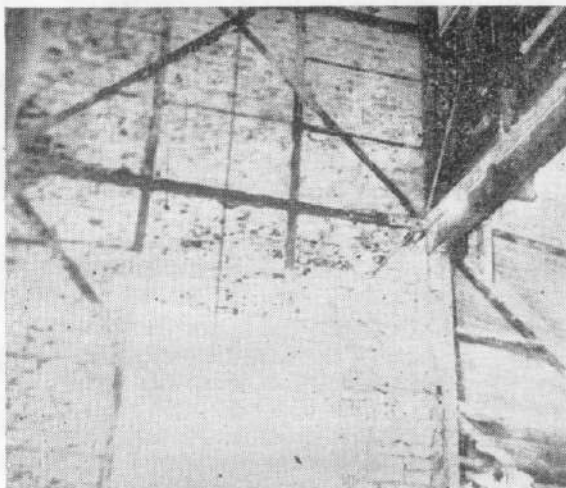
Brick panels in timber frame (Kashmir type-Dhajji-Diwari construction) forming partition walls in second storey level at Shri M. H. R. Rao's residence, which developed extensive cracks with displacement of bricks, necessitating their dismantling.
